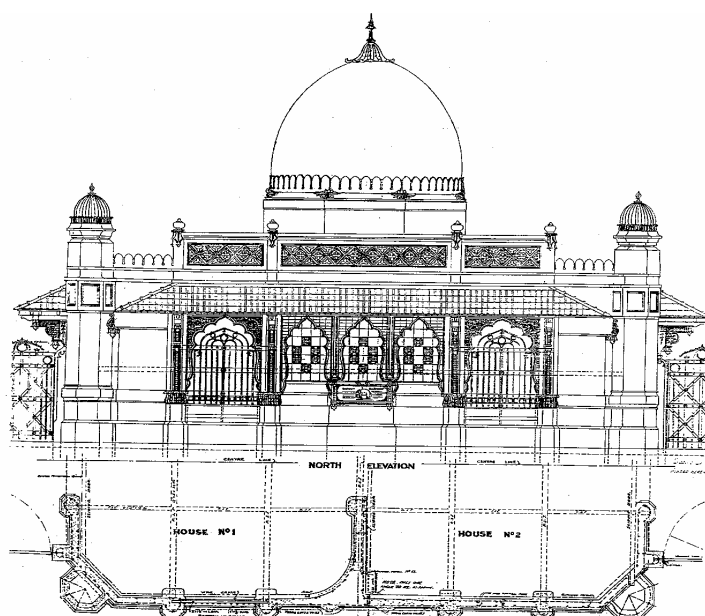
Elevation and part plan of the Indian Elephant Temple.
